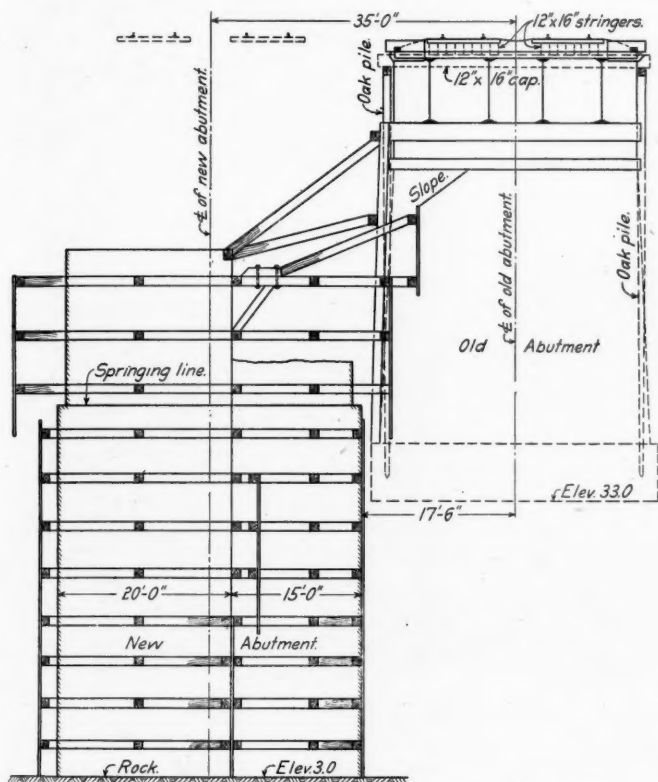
Method of Supporting Old Pier During the Construction of the New One.
